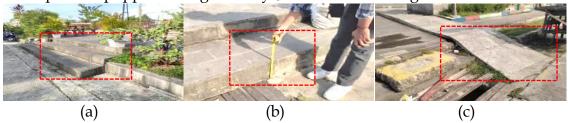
Stairs and Ramps. (a-b) Park Steps, (c) Park Ramps
